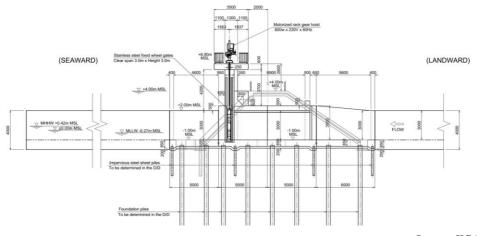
Plan of Sagakhan creek and Mahayahay creek Gates
